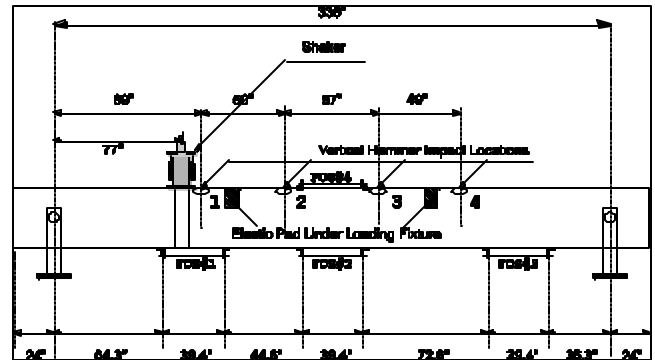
LAYOUT OF THE FOUR POINT BEND TEST OF THE BRIDGE BEAM
